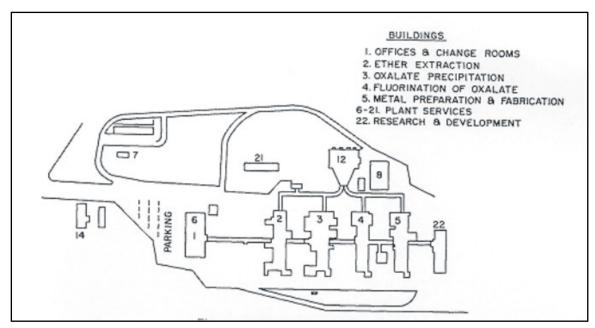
Early DP West Site Building Layout and Main Functions
